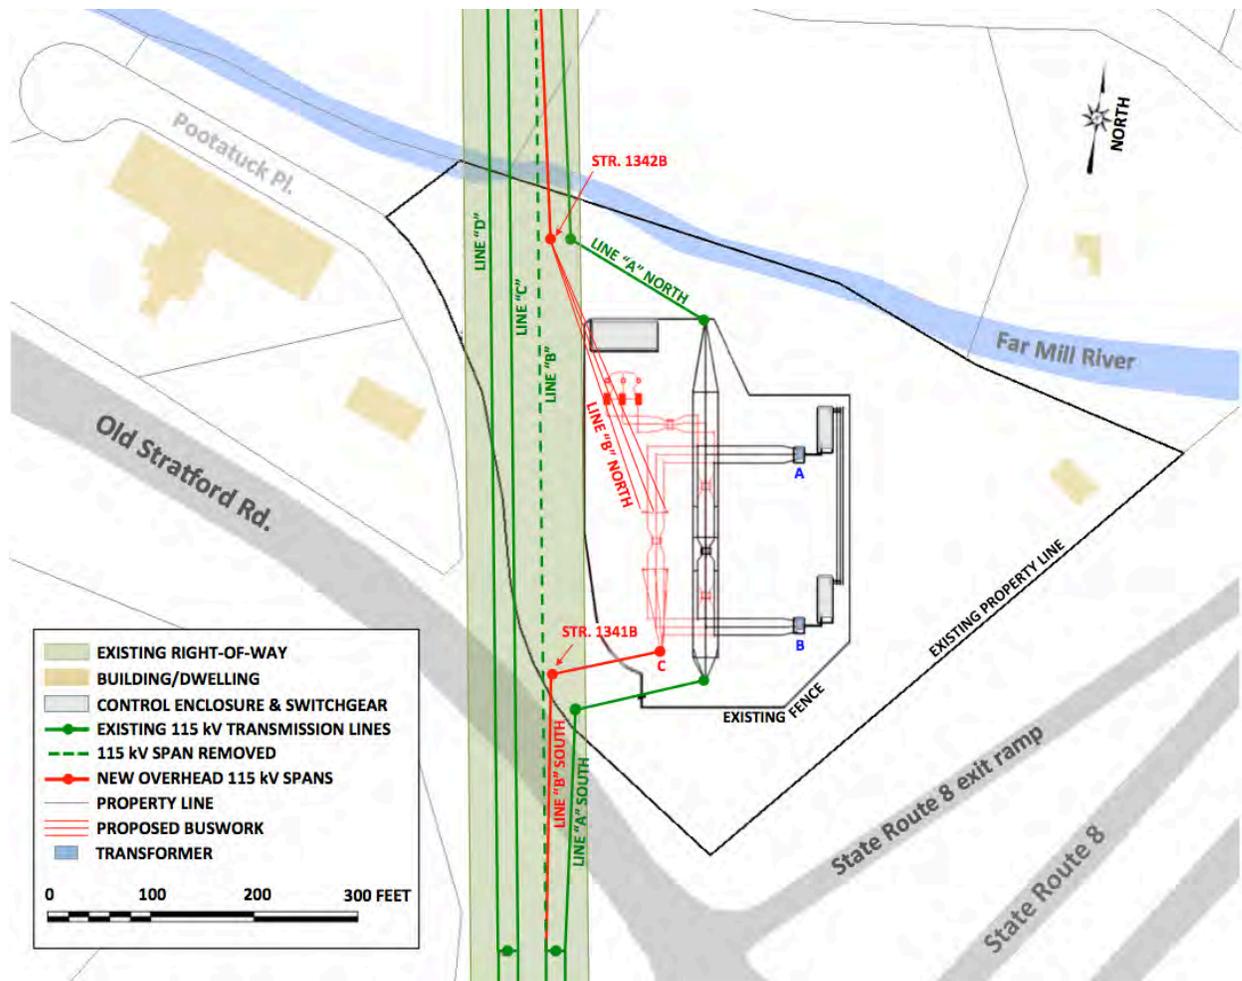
Plan view of the existing and proposed configurations of the Pootatuck Substation.
